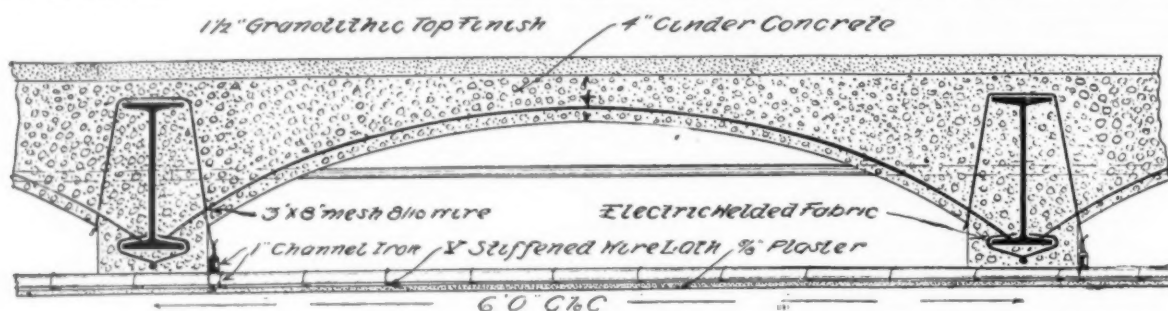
CROSS-SECTION OF CONCRETE FLOOR WITH ELECTRICALLY-WELDED FABRIC REINFORCING, SHOWING THE METHOD OF SUSPENDING THE CEILING.
